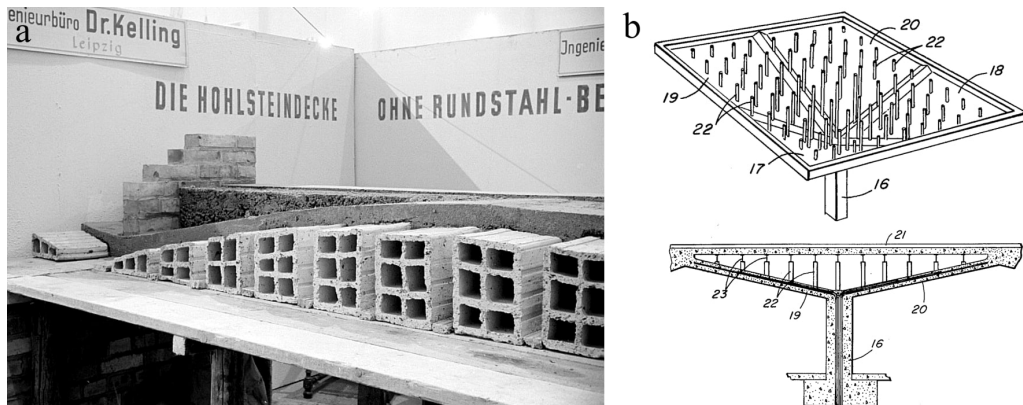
Examples of 20<sup>th</sup> century concrete shell floors, including the 1952 "Kelling-Decke" system (photo Deutsche Fotothek, license: CC BY-SA 3.0 DE) and b) a patent by Tully (1979).
